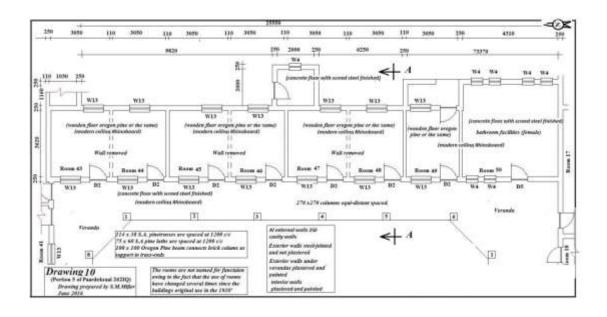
Above. Layout of rooms 43 to 50. (Drawing S.M. Miller 2016.)
